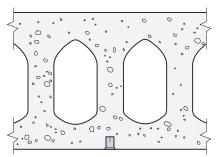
Hollow-Core Concrete Panel (anchor can be installed below web or hollow core)
